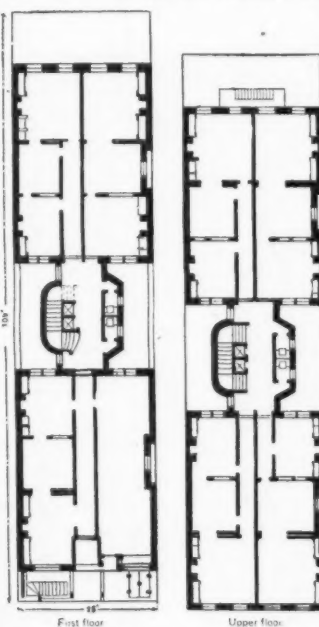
First-Prize Plan, Tenement-house Design Competition of 1879, New York City.
